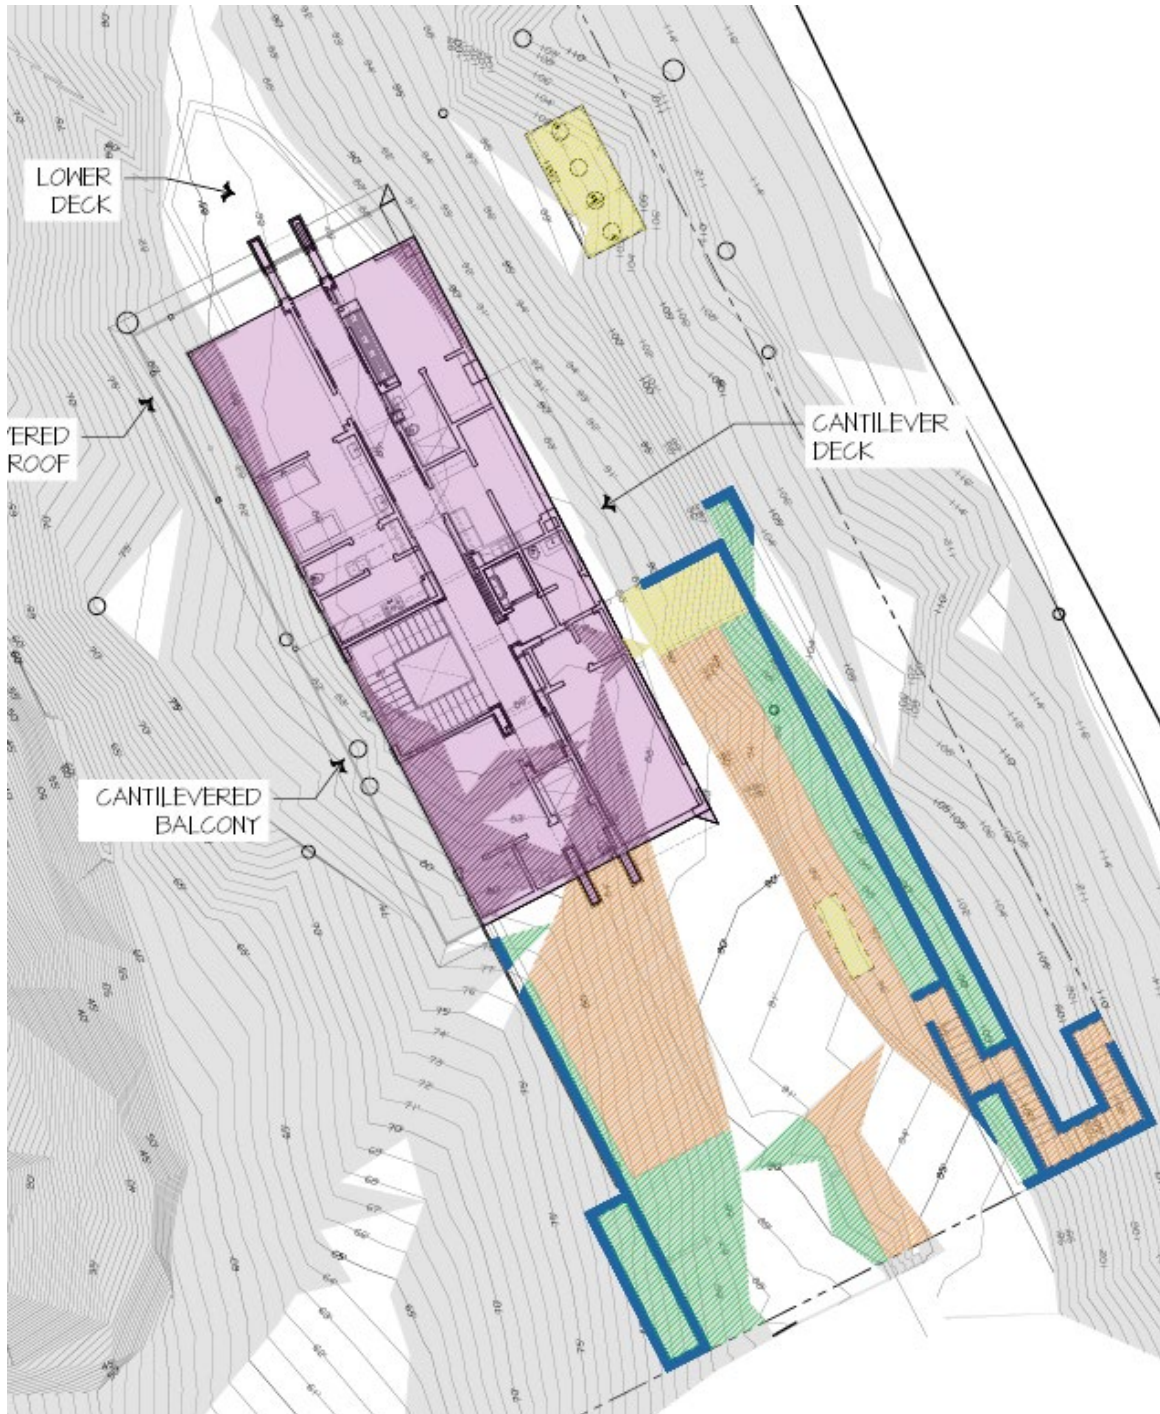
Revised April 10, 2025 Development on Slopes Site Plan.
